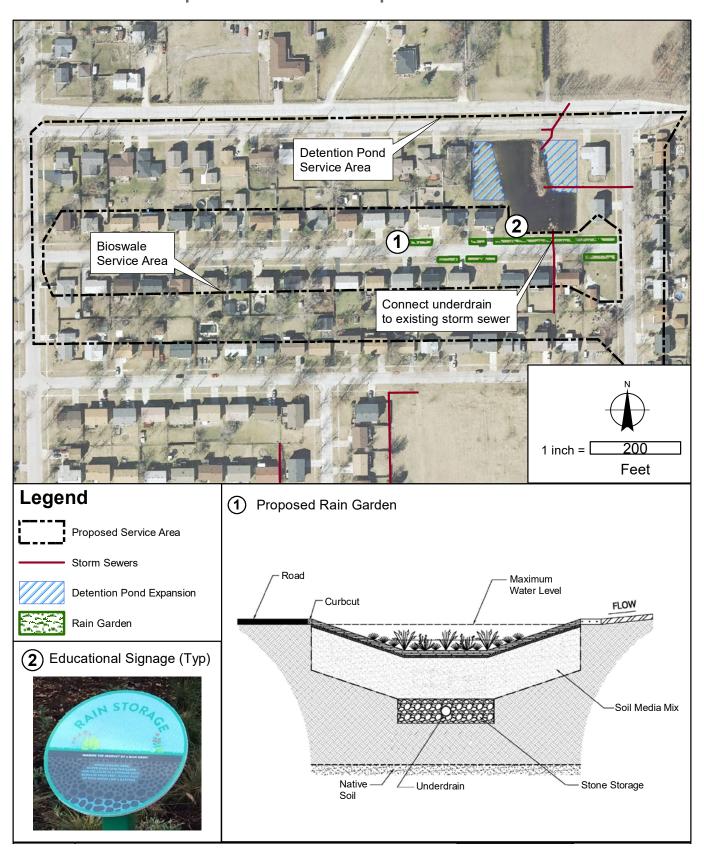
Stormwater Improvements Parkway Concept Plan
